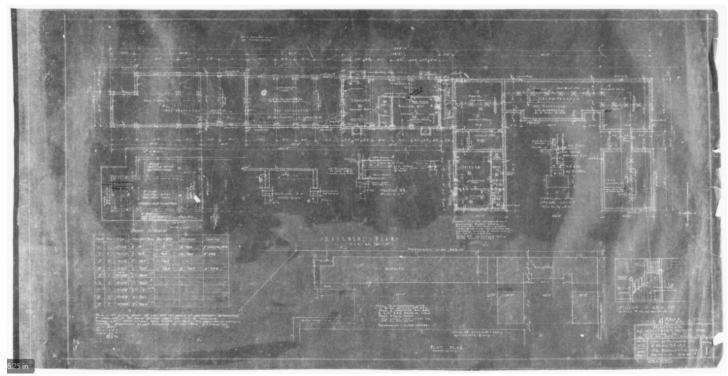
Beauville, Basement Plan – 1928 (1 of 7)
